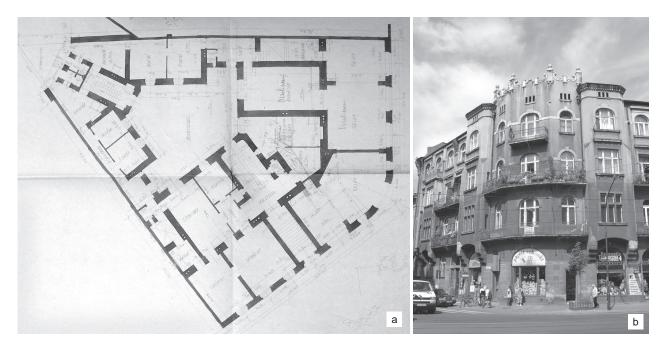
Townhouse at 1 Studencka Street / 4 Podwale Street (designed by T. Hoffmann, 1910–1912): a) ground floor plan (source: ANK, ABM Studencka 1, fsc. 689), b) façade (photo by B. Makowska)
